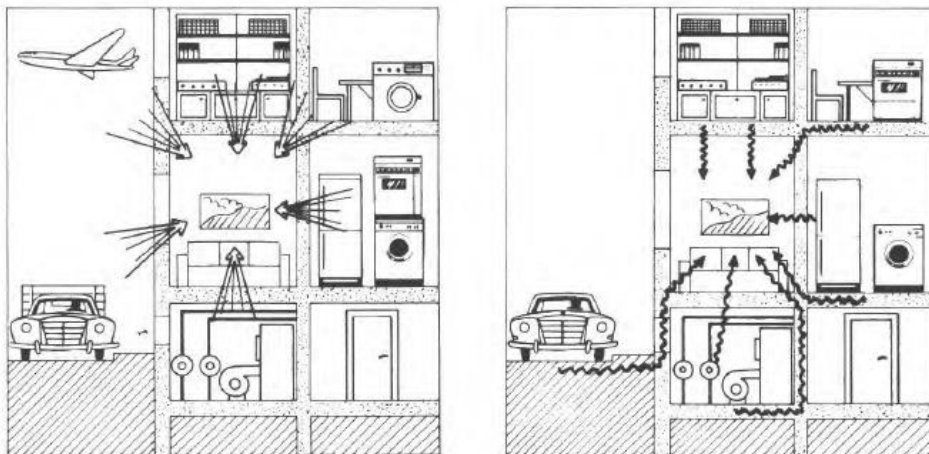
The left photo shows the source of noise in air base transferring and right photo shows the sources which impact on the building structure (Ginn, 1978)
